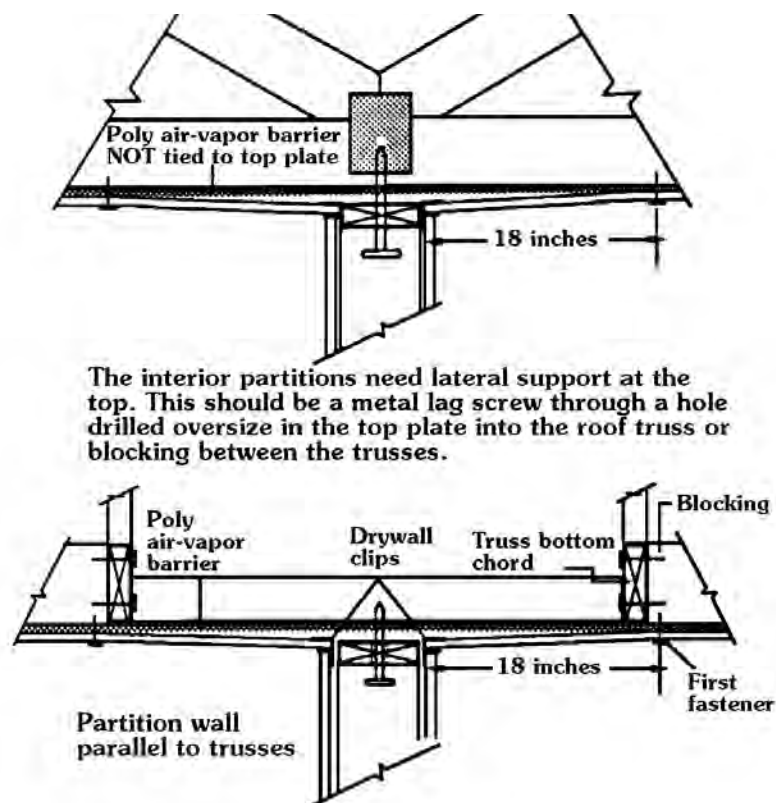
Drywall details to avoid damage or ugly cracking from roof truss uplift.
